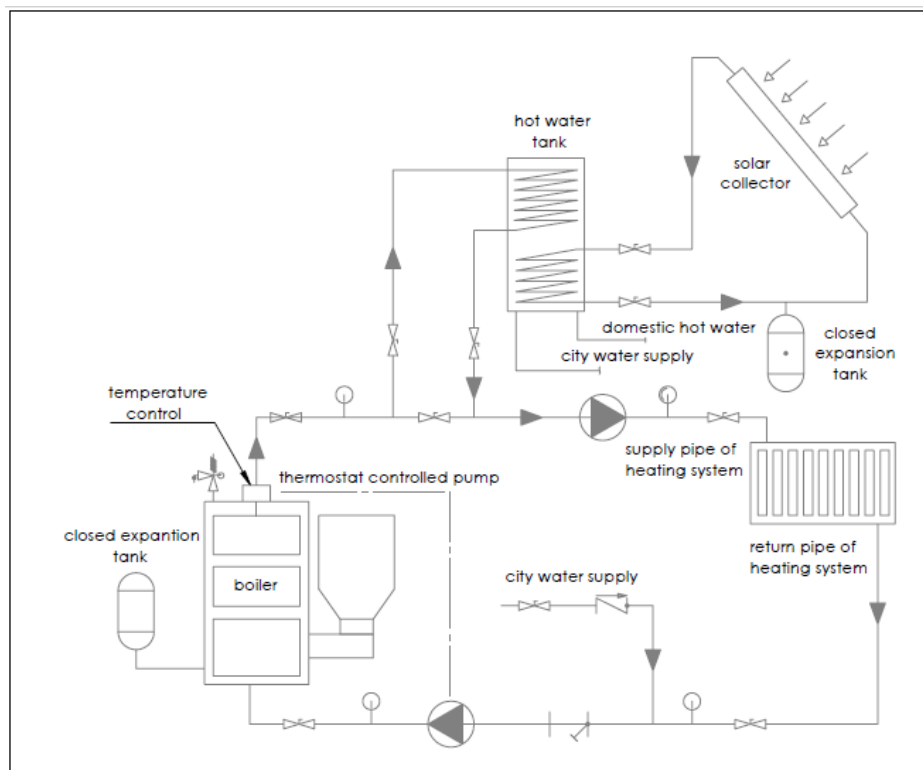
Hydraulic diagram: closed pressurized expansion tank system.
